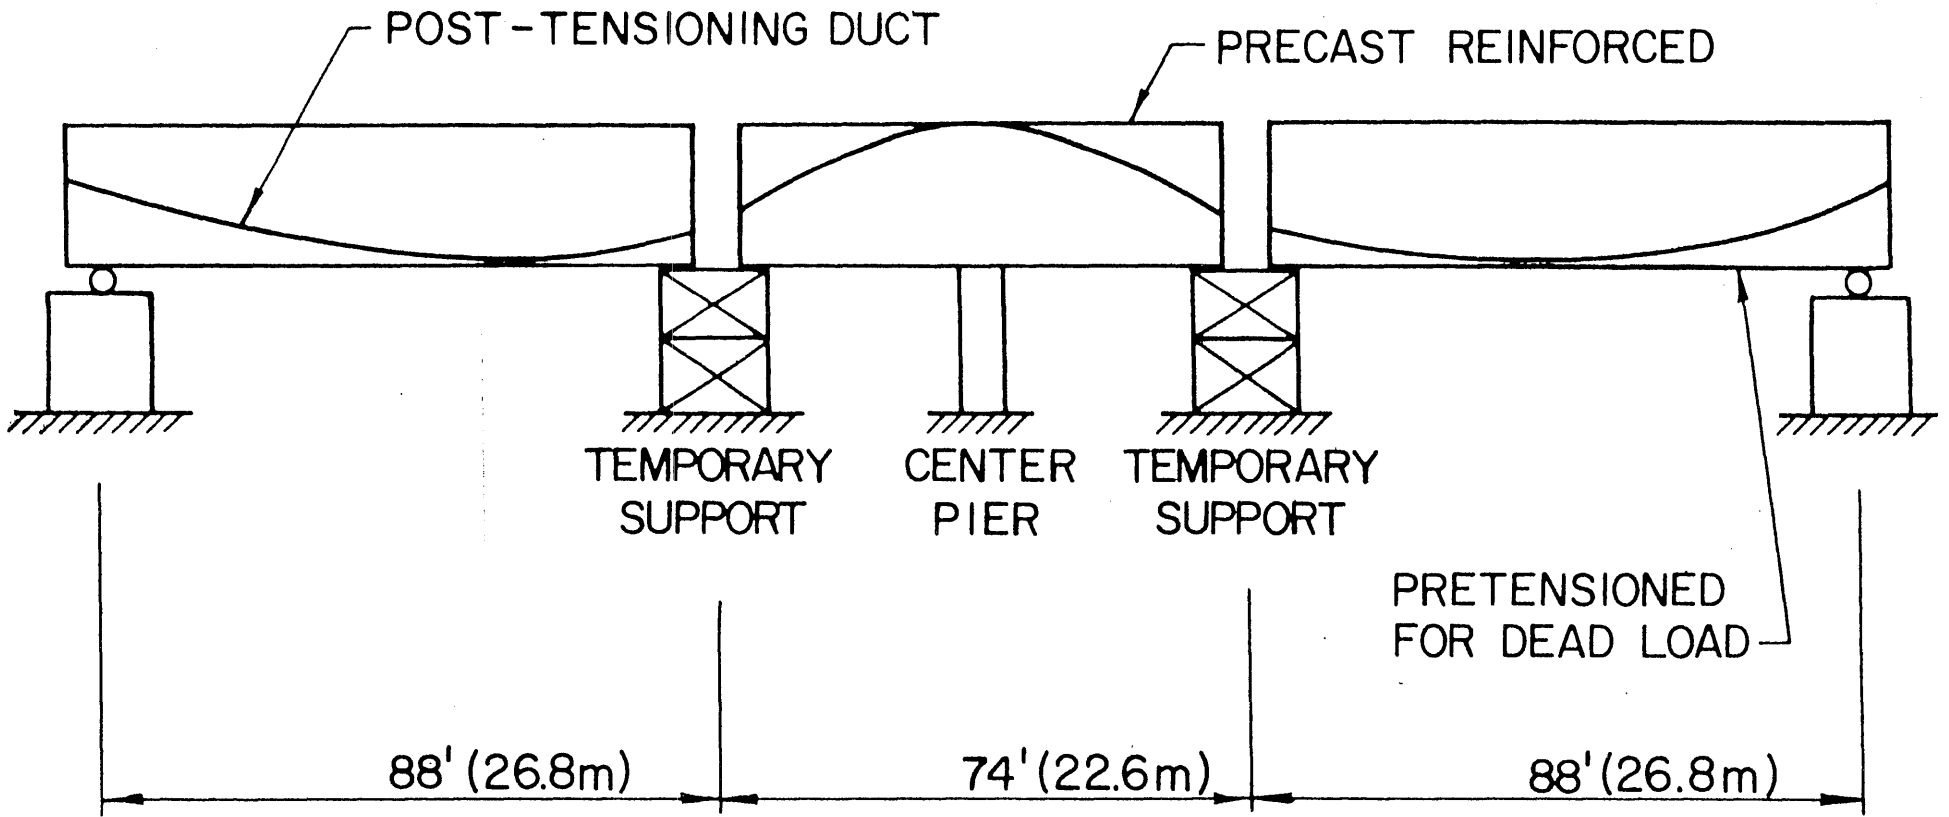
SEGMENTAL GIRDERS PLACED ON FINAL AND TEMPORARY SUPPORTS
